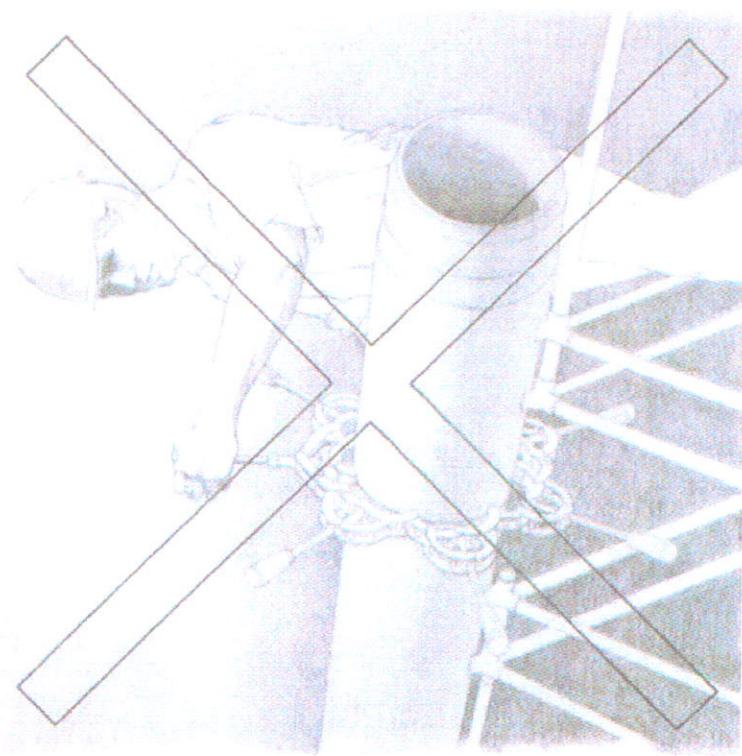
Carbide-tipped cutting blades should not be used to cut asbestos-cement pipe.
